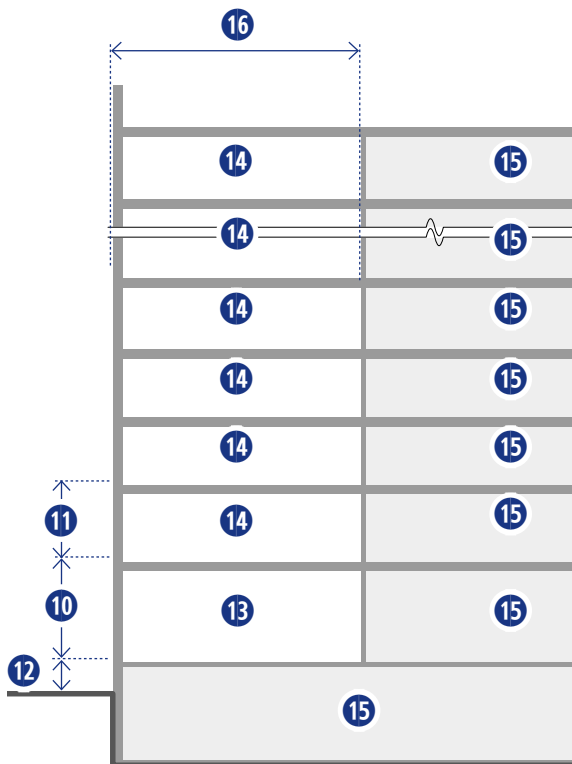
General Building: Floor-to-Floor Height & Use Requirements
